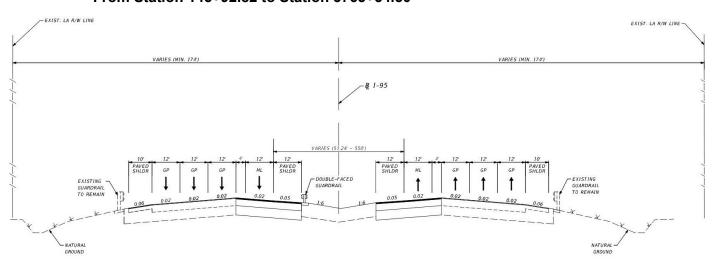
Proposed I-95 Typical Section, Part 2
